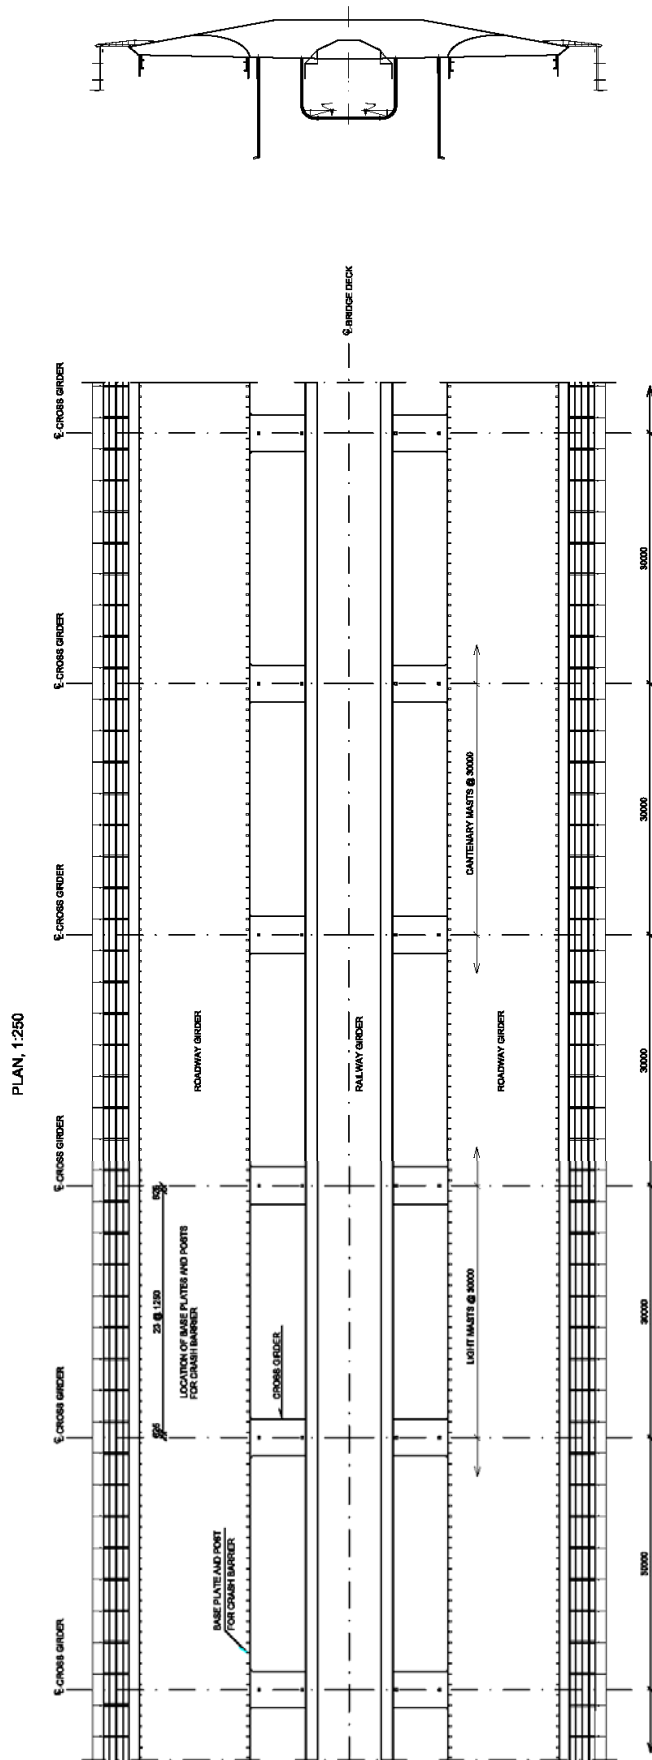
PROTOTYPE DIMENSIONS OF DECK PLAN
